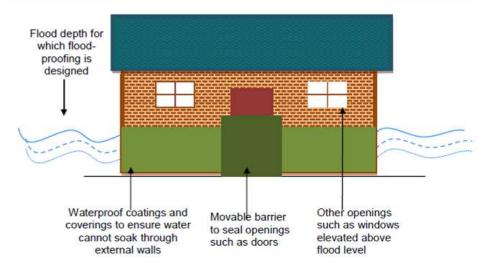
Hazard proofing existing substantial buildings in high hazard zones
